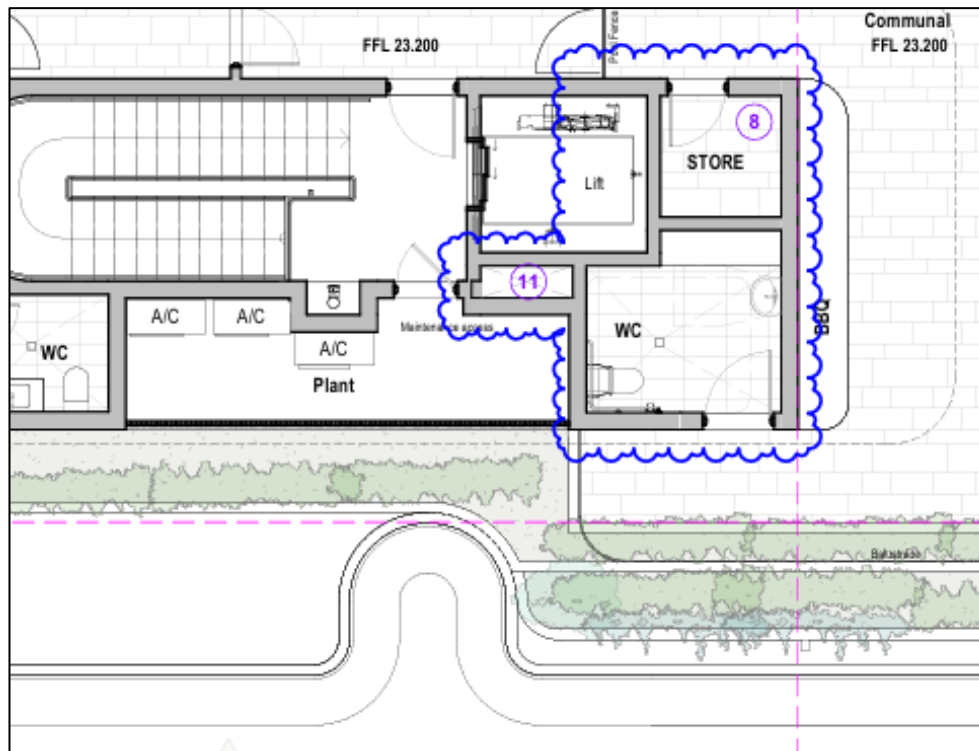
Proposed Plant screening and bathroom location - Extract (Source: ELK Architects)
